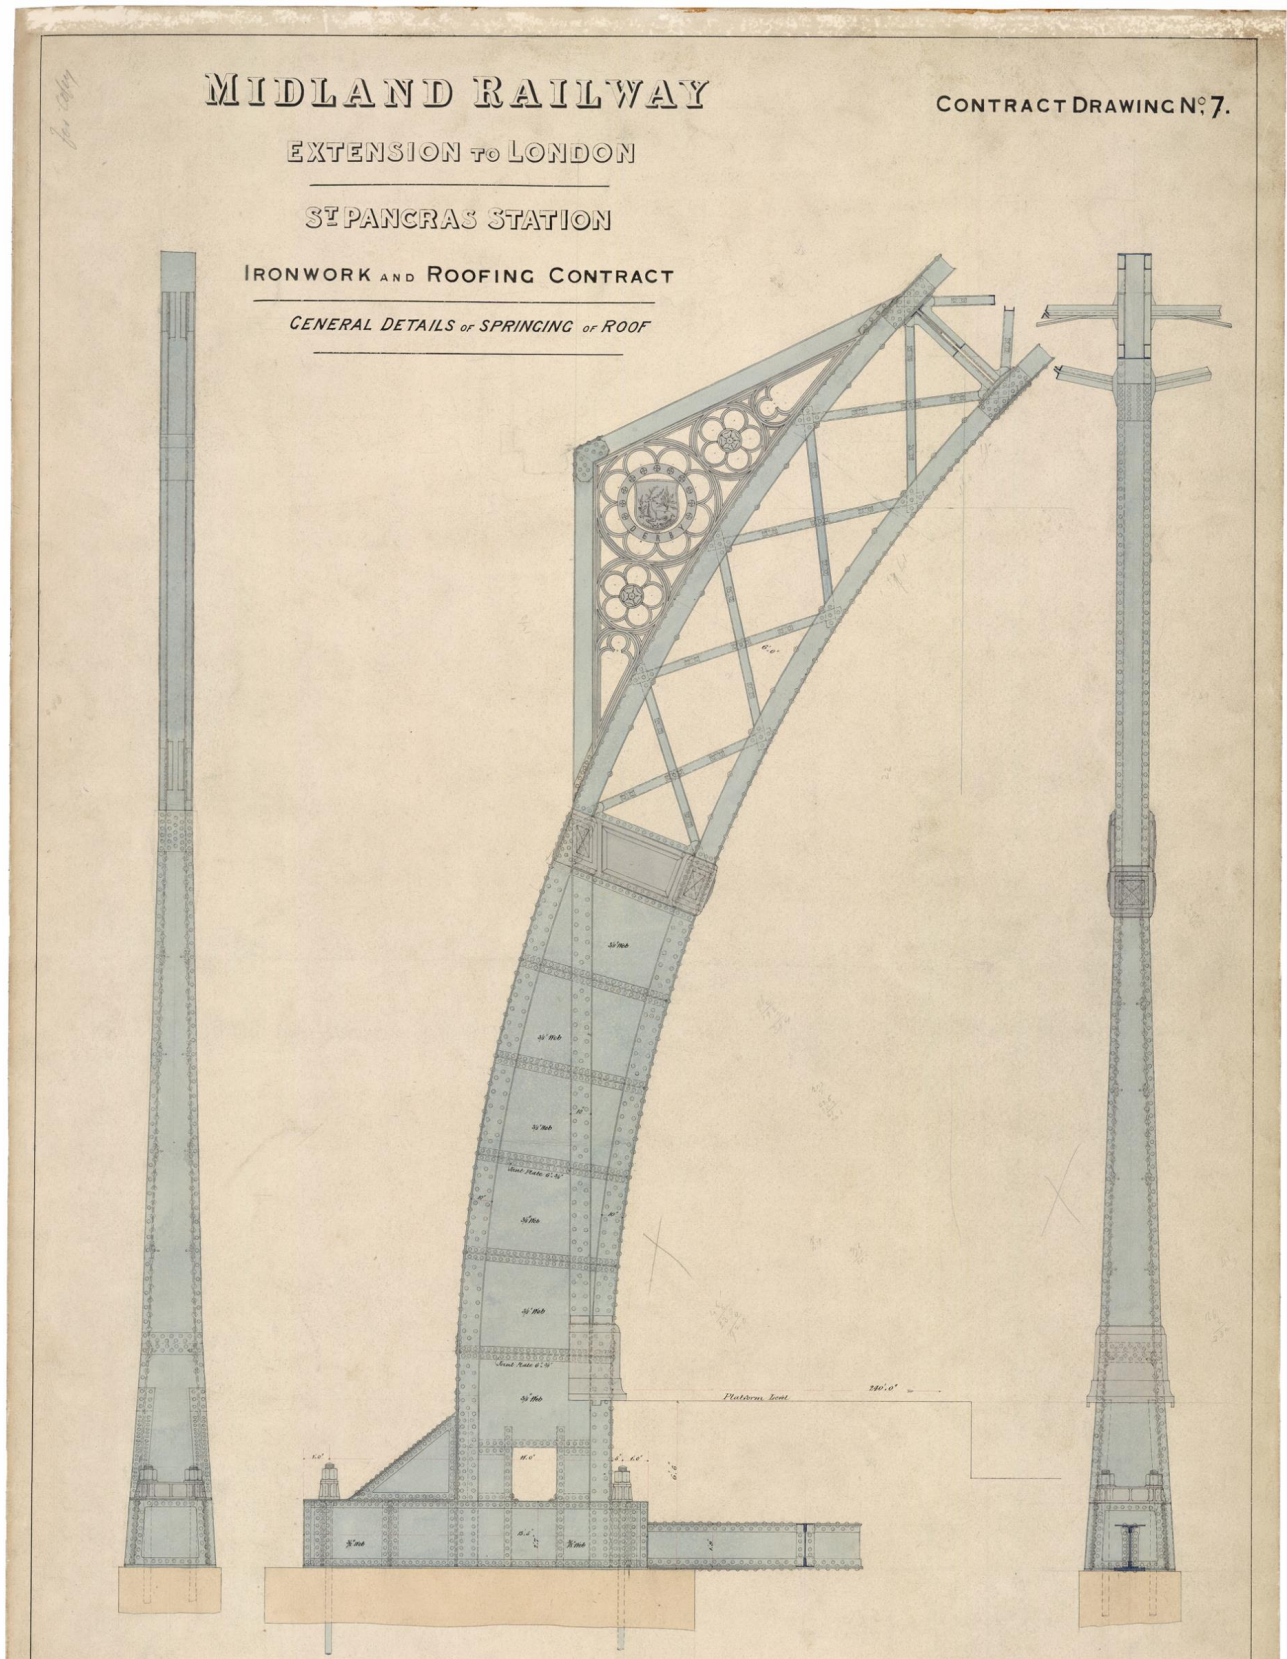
Section detail of the St. Pancras Train Shed arch roof springing with decorative circular spandrel plates (Barlow, 1868)
